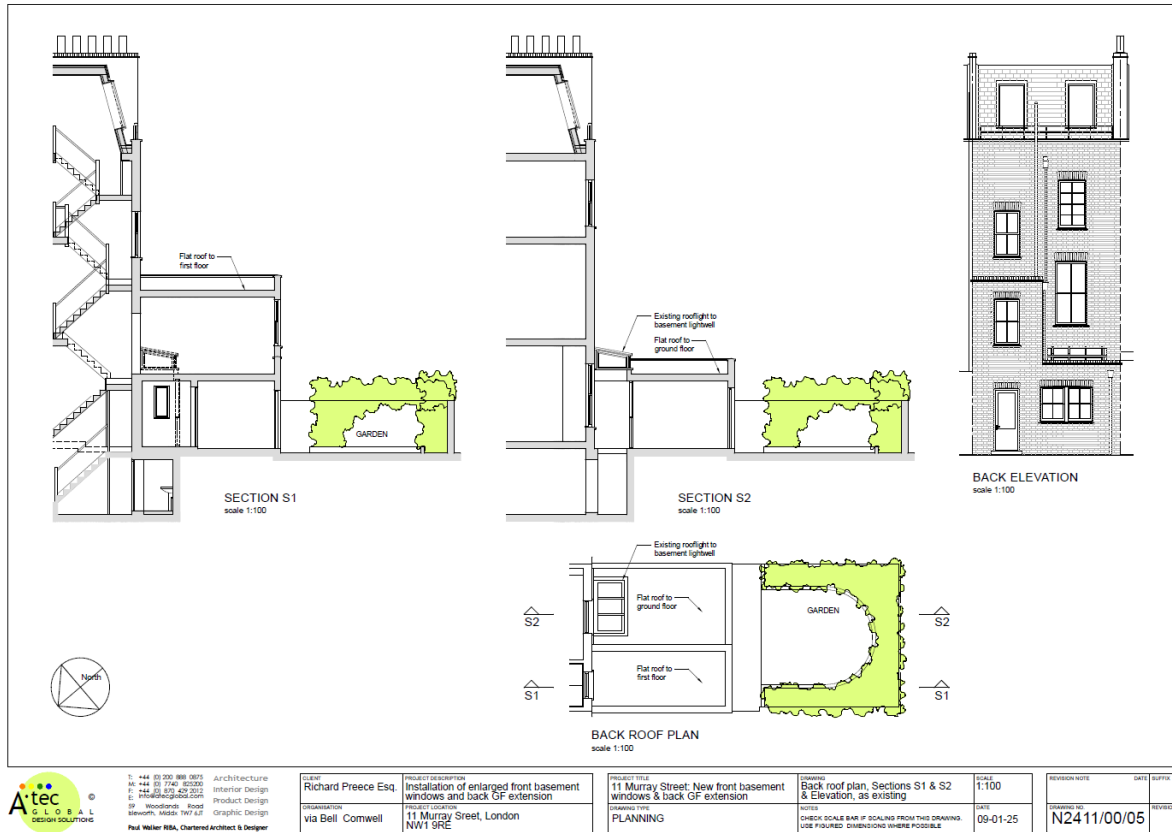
Existing sections and roof plans (Source: submitted drawings)
